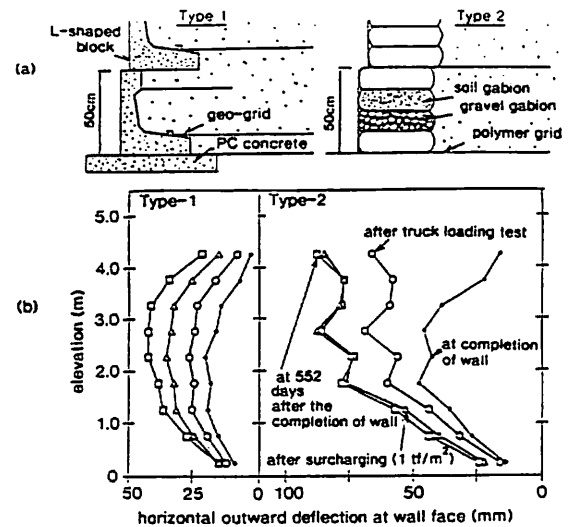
Long-term observations of two GRS-RWs having different types of facing: (a) facing types and (b) the displacement at the wall face (Naemura et al., 1991).
